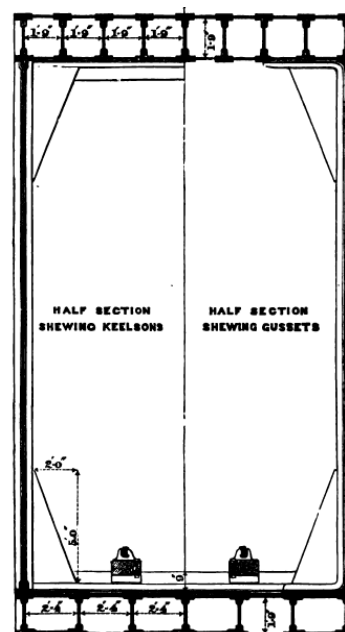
Britannia Bridge (Cross Section of Tubular Girder).
